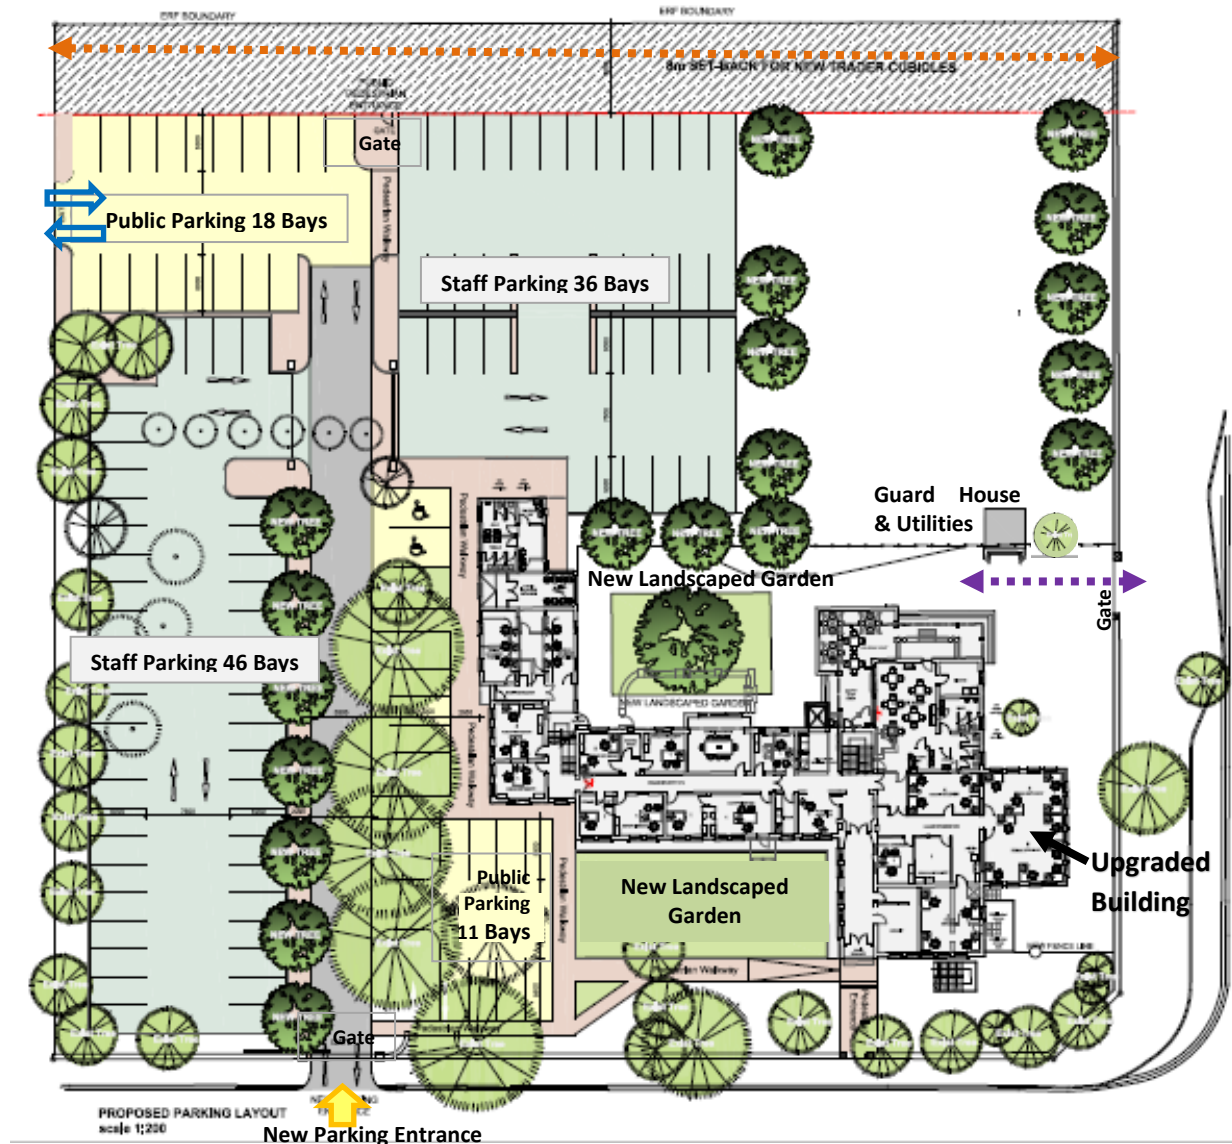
Concept plan (from SDK Architects: Parking Proposal 31 Oct 2022)
